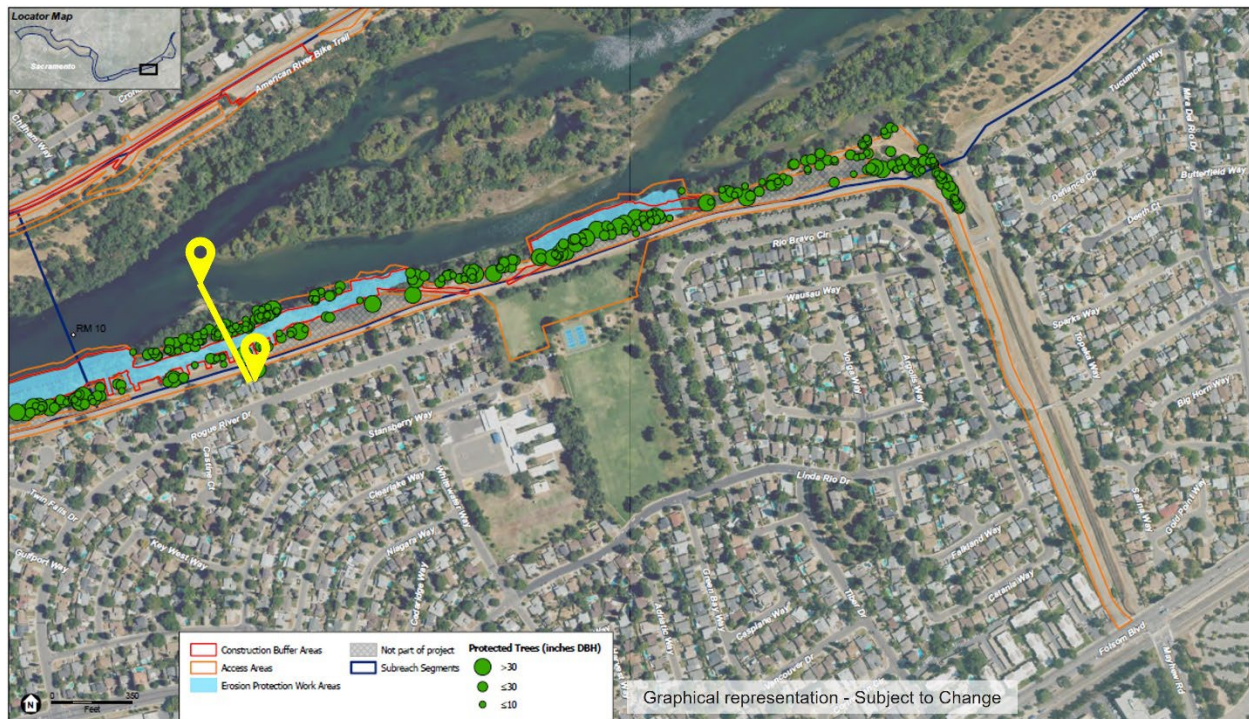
Partial Layout of Segment 3-8 erosion protection feature and cross section location
